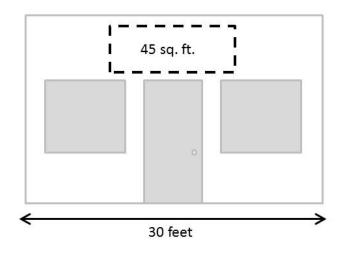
CALCULATING SIGN ENTITLEMENT - MULTI-TENANT BUILDING
